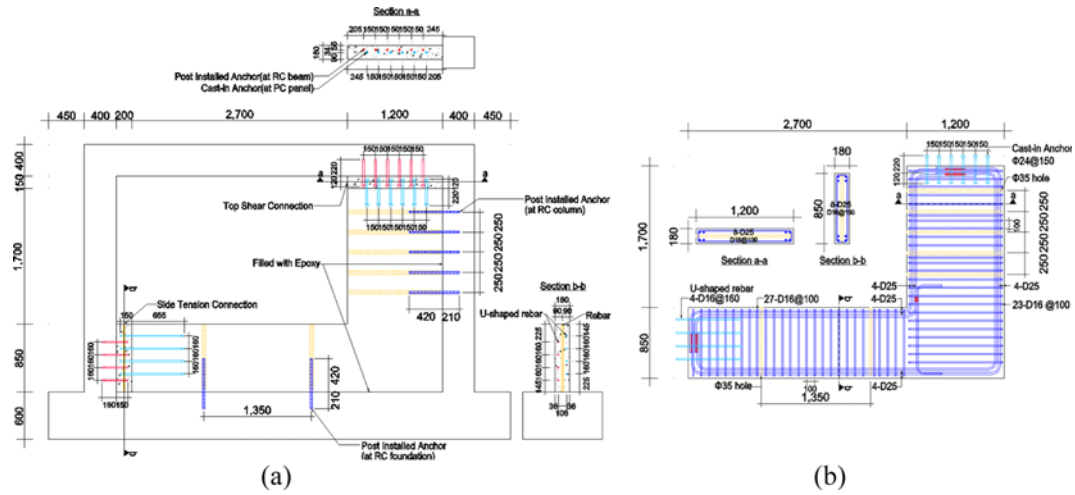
Dimensions and Reinforcement of Specimen LA3-H5V2 (mm): (a) RC Frame with PC Wall Panel, (b) PC Wall Panel
